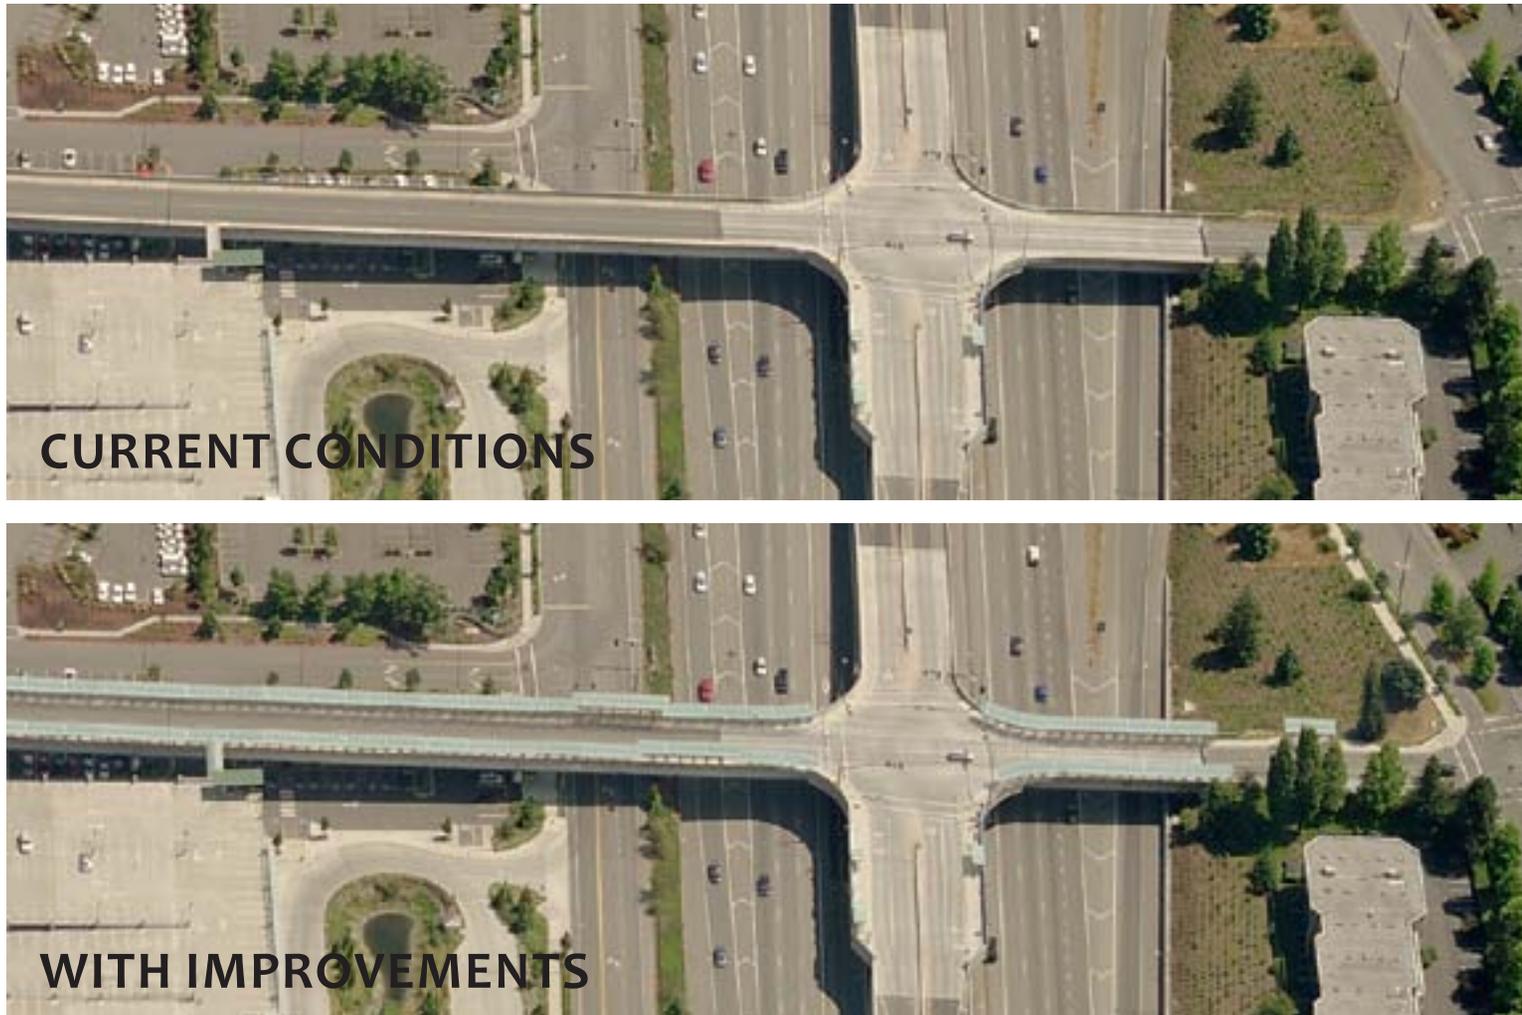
Proposed 142nd Place SE Bridge and MTS Greenway Trail Improvements
